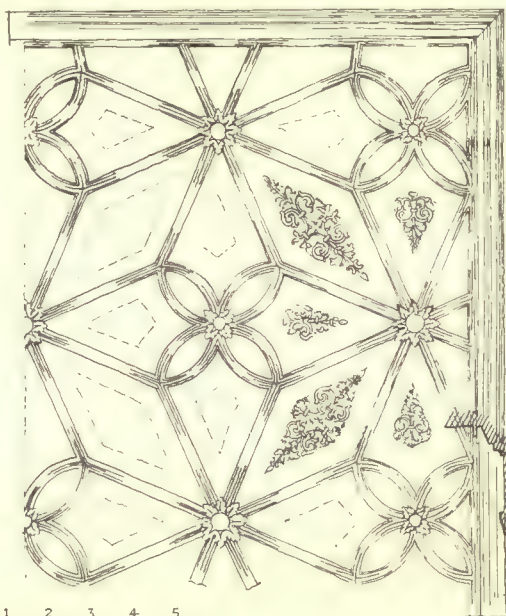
Ceiling of Staircase Hall (quarter only drawn).
